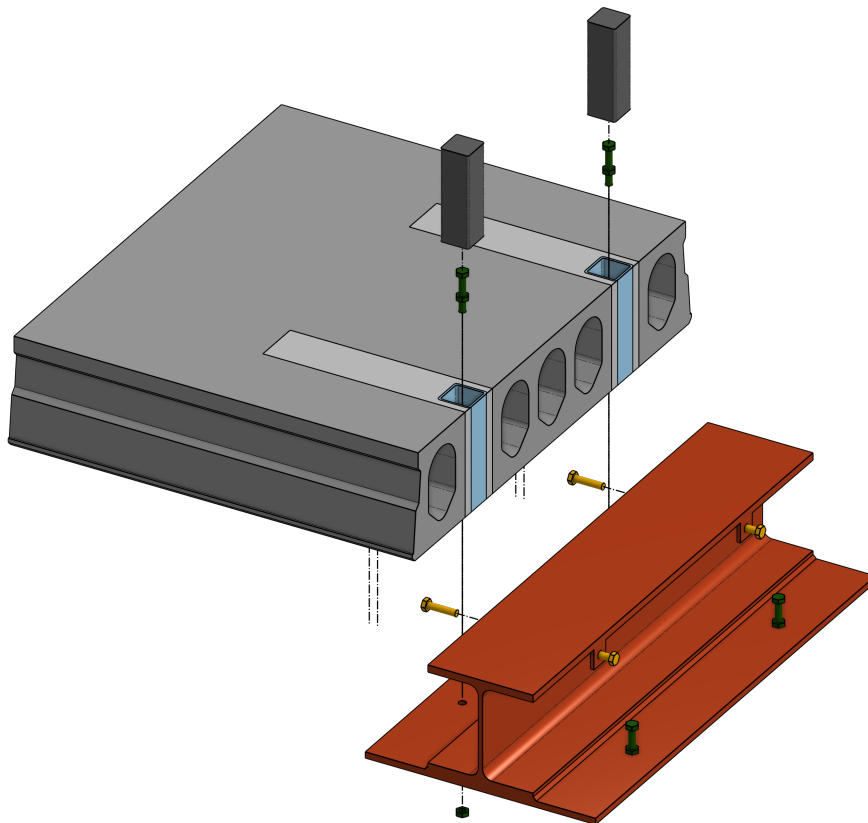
Connection detail with bolted demountable shear connector (exploded view)
